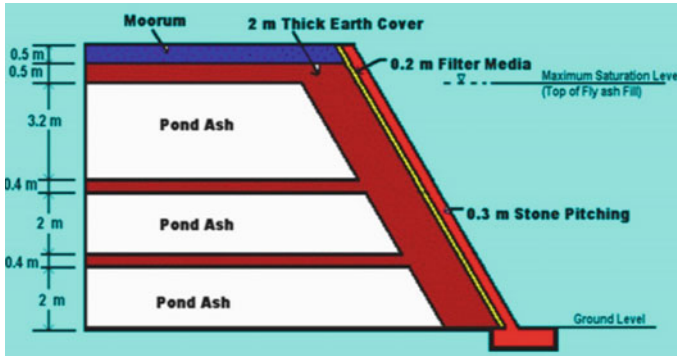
Road embankment for Nizamuddin Bridge Project, Delhi
